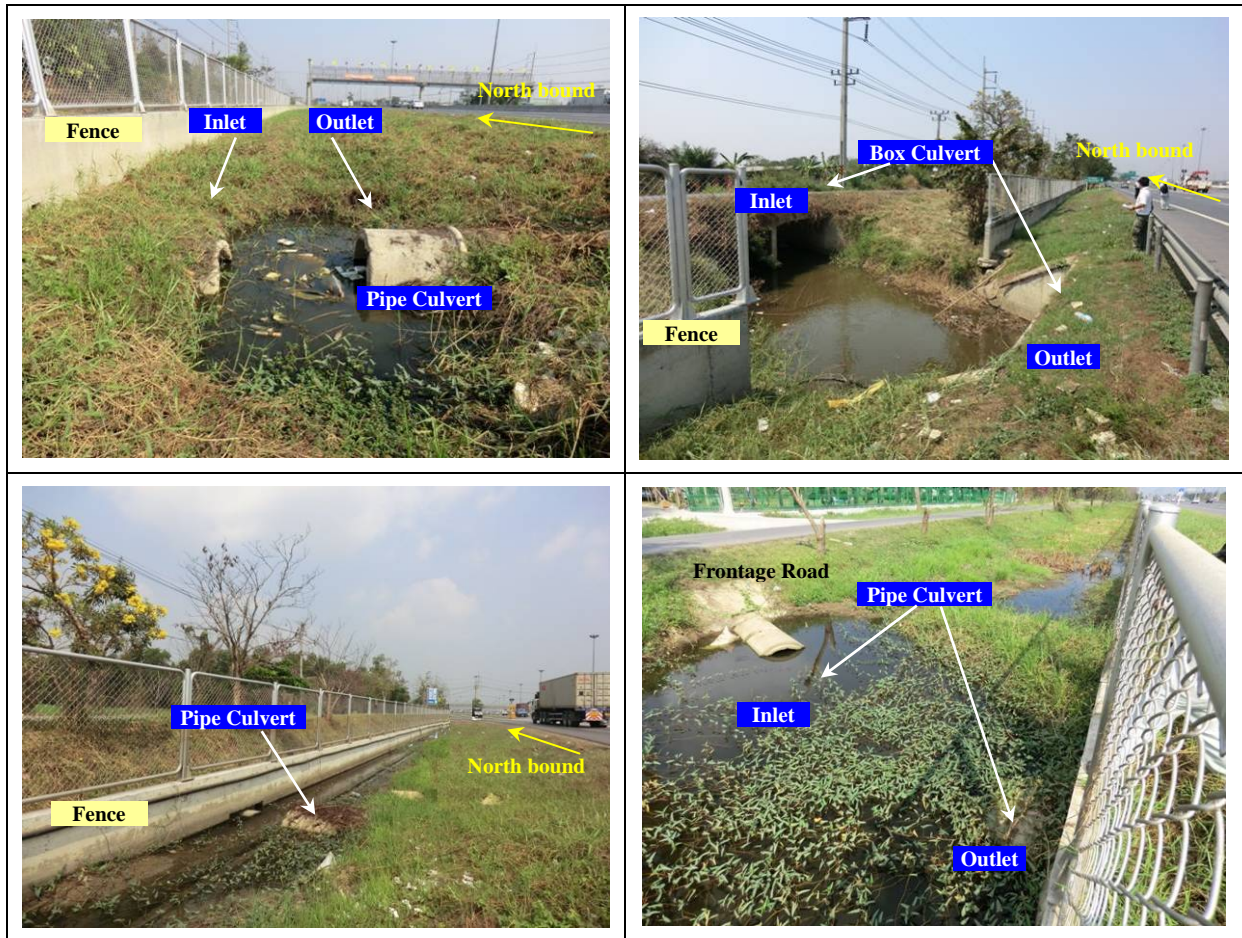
Types of Inlet / Outlet of Drainage Facilities
